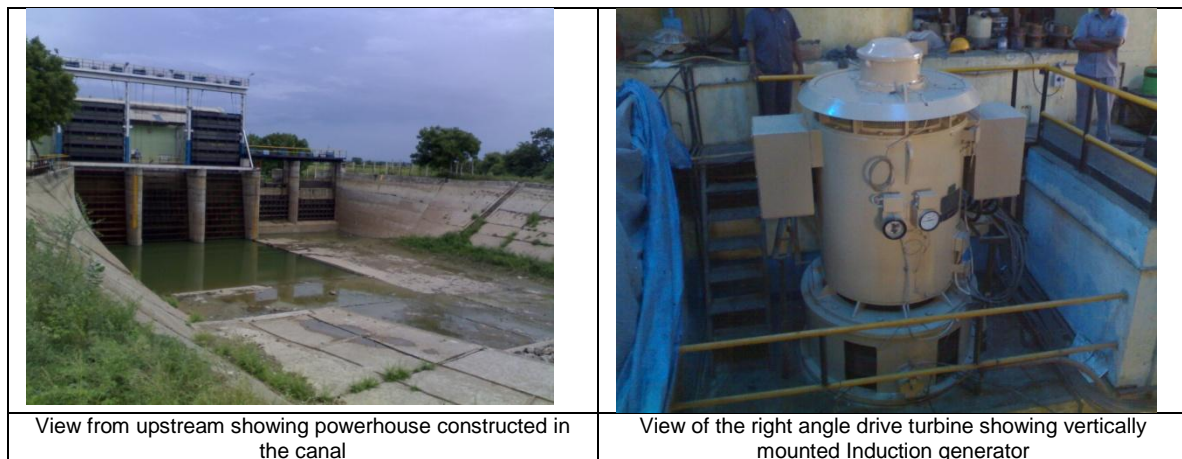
Views of Guntur Branch Canal Powerhouse 3
